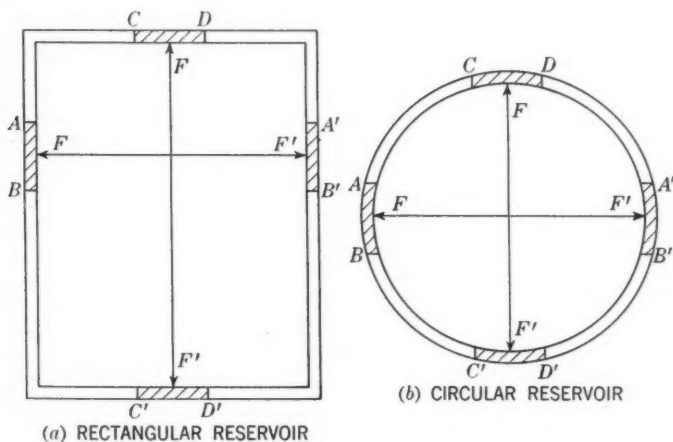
VERTICAL-BEAM WALLS ARRANGED TO BALANCE OPPOSING FORCES
